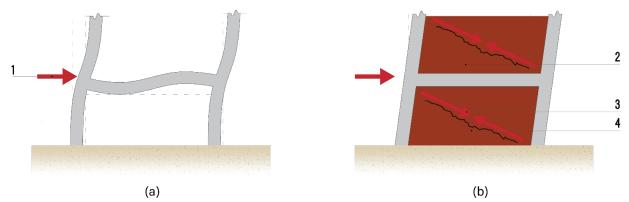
(a) An elevation of a bare or open column and beam frame that is bending sideways in an earthquake (1). (b) shows how the infill (2) prevents bending, experiences a diagonal compression stut (3) and diagonal cracking (4).
